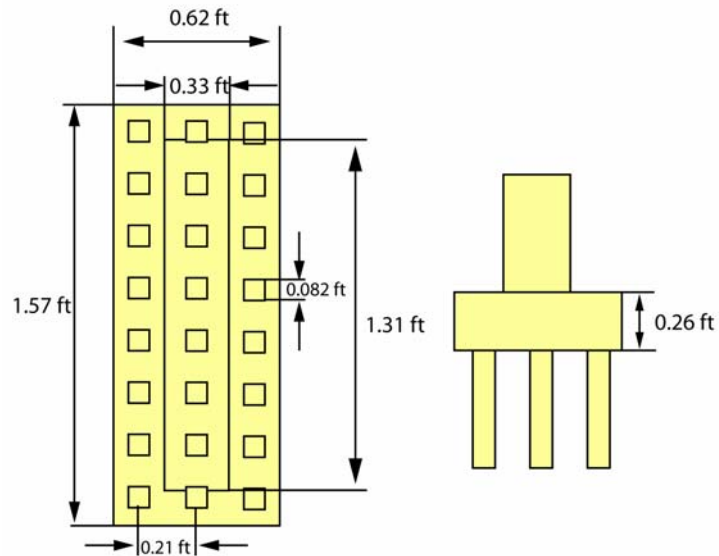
Plan and elevation view of model complex pier 3 (Type C, All dimensions are in feet).
